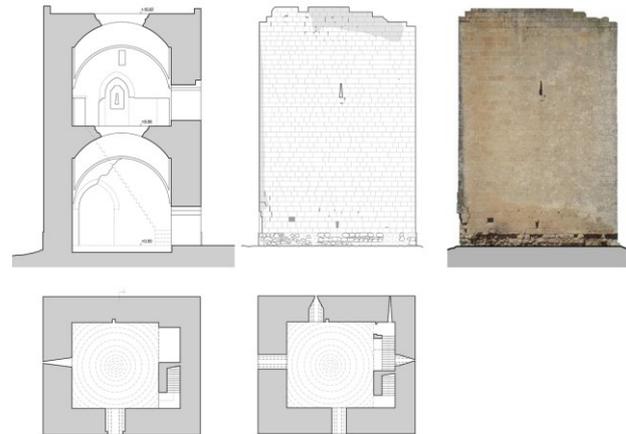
Torre Lopera in Montellano, Seville. Floor plans. Section and photogrammetric elevation.
